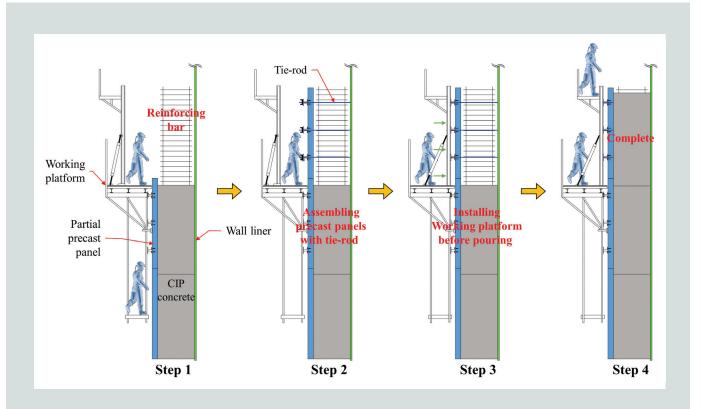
Construction procedure for outer tank with partial-thickness precast concrete panels. Note: CIP = cast-in-place.
